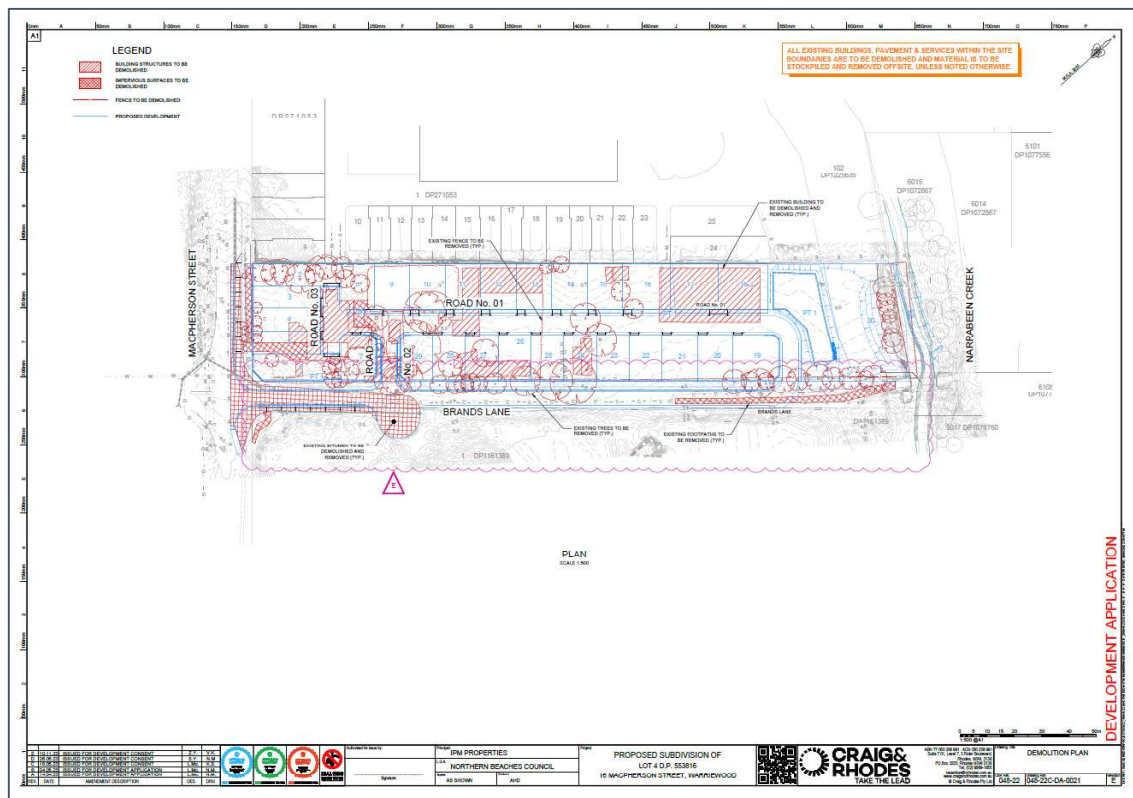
Approved demolition plan (Source: Craig & Rhodes)
